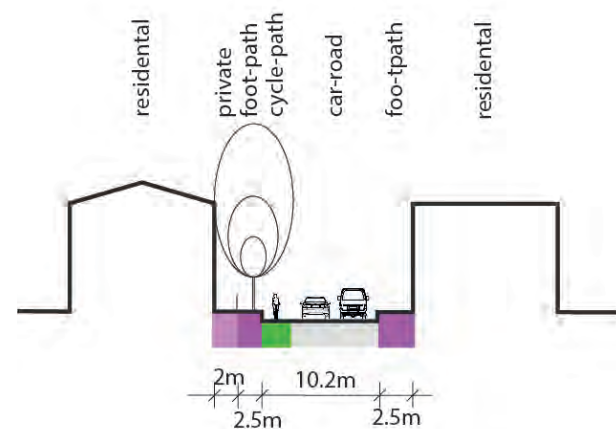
Section B-B: Cranford Street widening as proposed.
